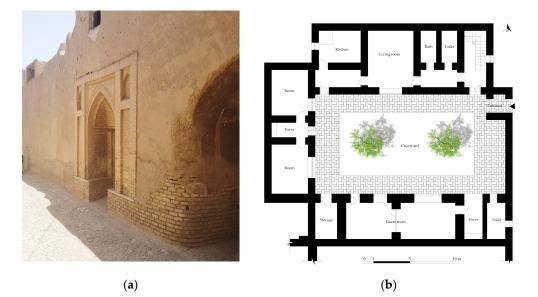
House in Old City of Herat: (a) old house entrance (photo by authors); (b) old house floor plan (drawn by the authors based on case studies).
